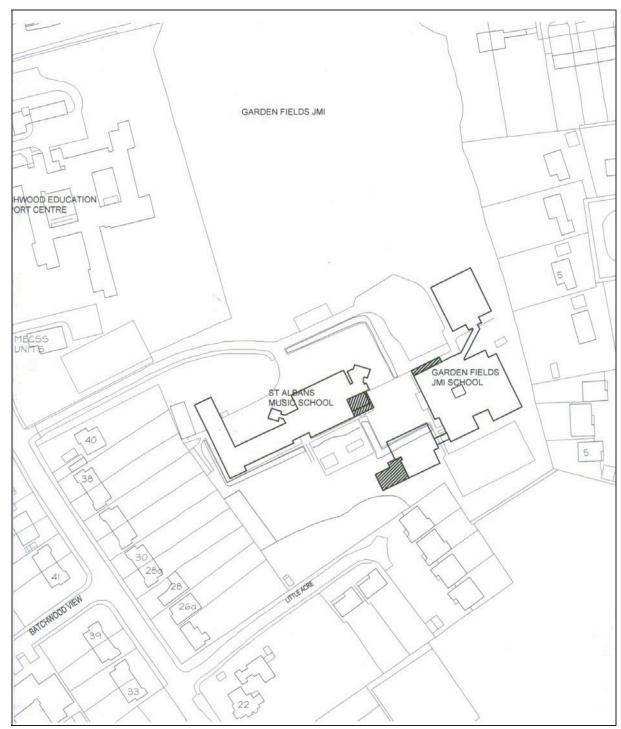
Site plan showing location of building extensions (shaded). Not to scale.
